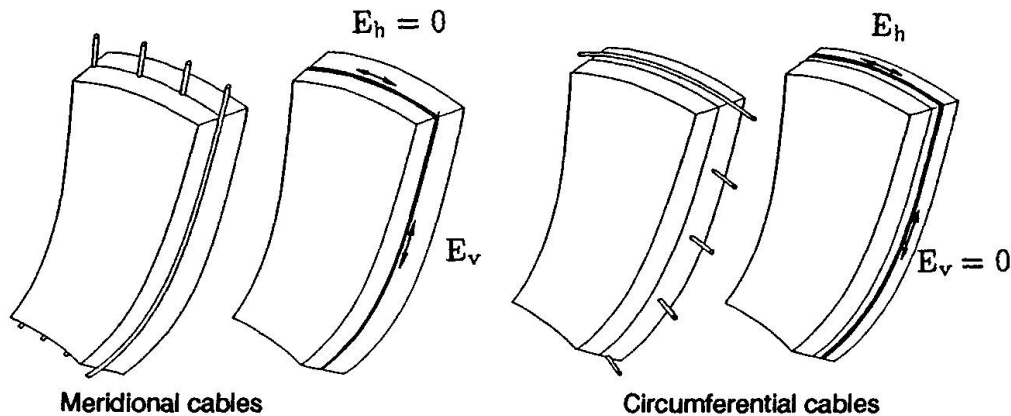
Prestressing cable position and finite element idealisation (Axial elements).
